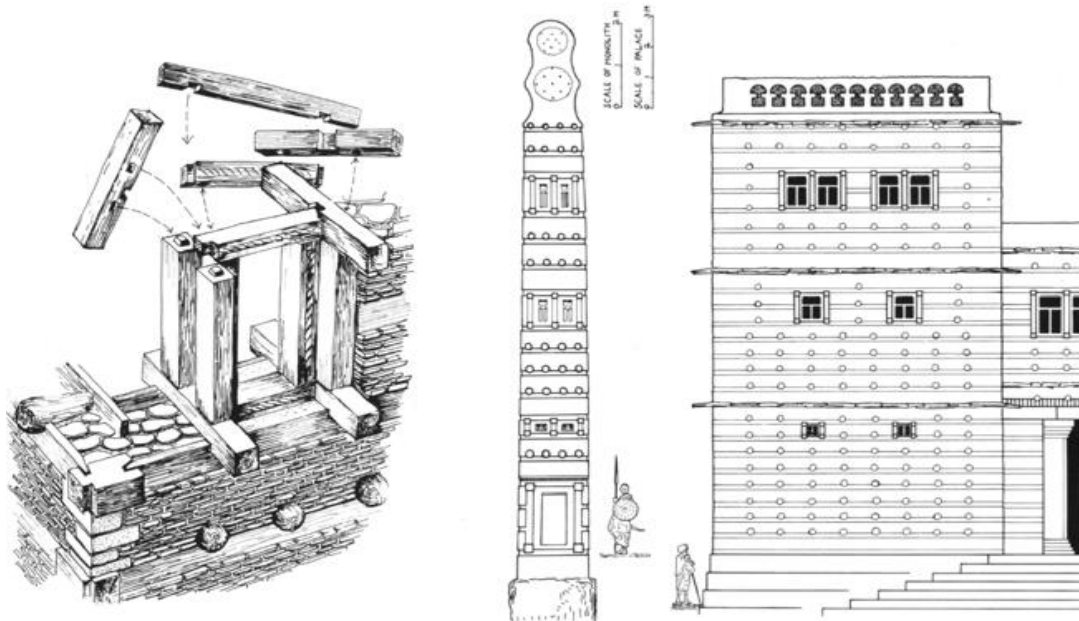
Reconstruction of ancient Aksumite wall-building techniques, including a window frame (left) . Reconstruction of palace façade as based on Ende Mikael reconstruction by Krencker (right) (Buxton and Matthews 1971, 56).
